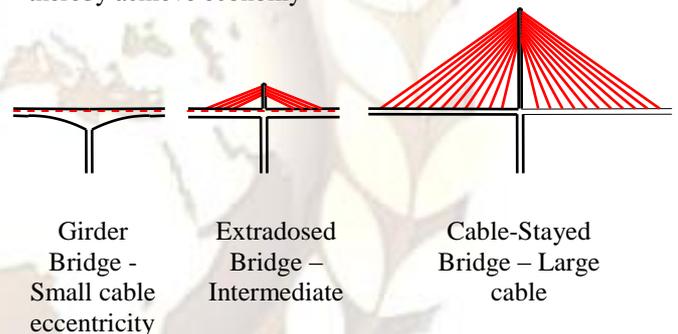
Cable arrangements in Girder Bridge, Extradosed Bridge and Cable stayed bridge
